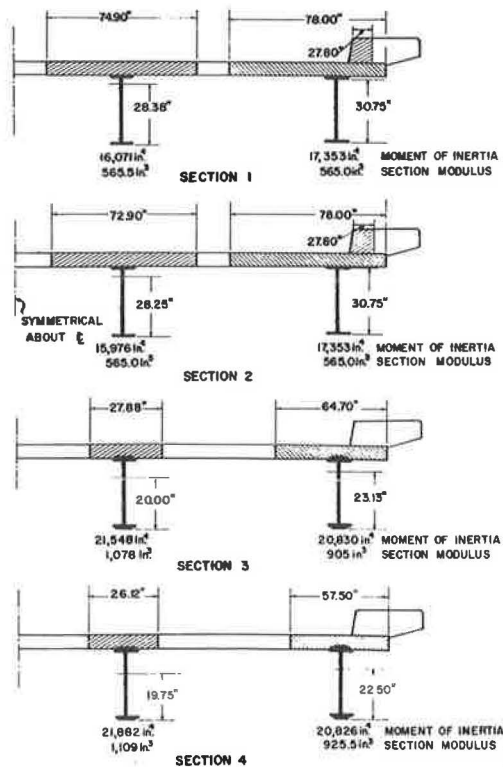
A cross-section of the steel stringer bridge at sections 1, 2, 3, and 4 showing the composite moments of inertia, section moduli, and the effective slab.
